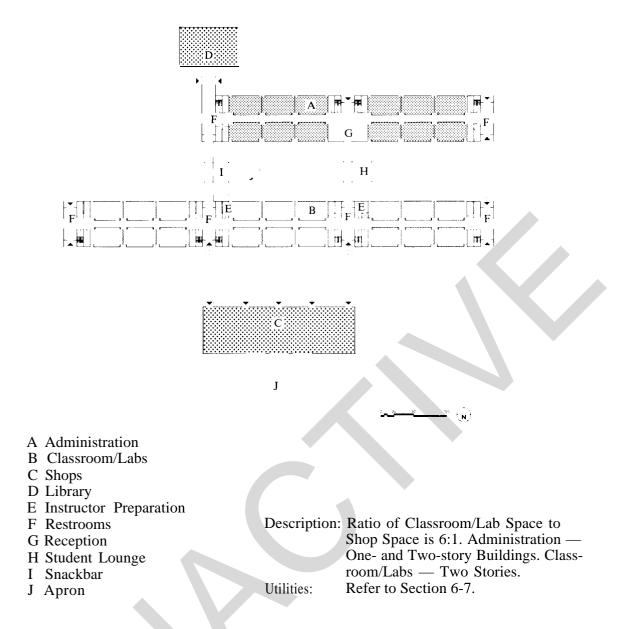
Illustrative Plan, 150,000 Sq. Ft. School (Primary Instruction Space; Classroom).
